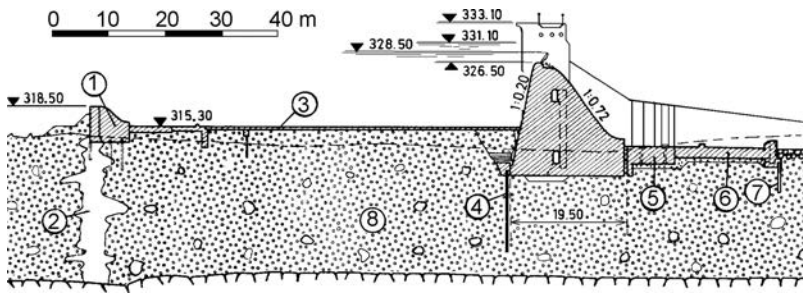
Jajce dam, Bosnia and Herzegovina (YCOLD, 1970). (1) Cofferdam; (2) grout curtain; (3) concrete blanket; (4) sheet piling made of Larssen piles; (5) slab in front of stilling basin; (6) stilling basin; (7) timber piling; (8) alluvial deposit.
